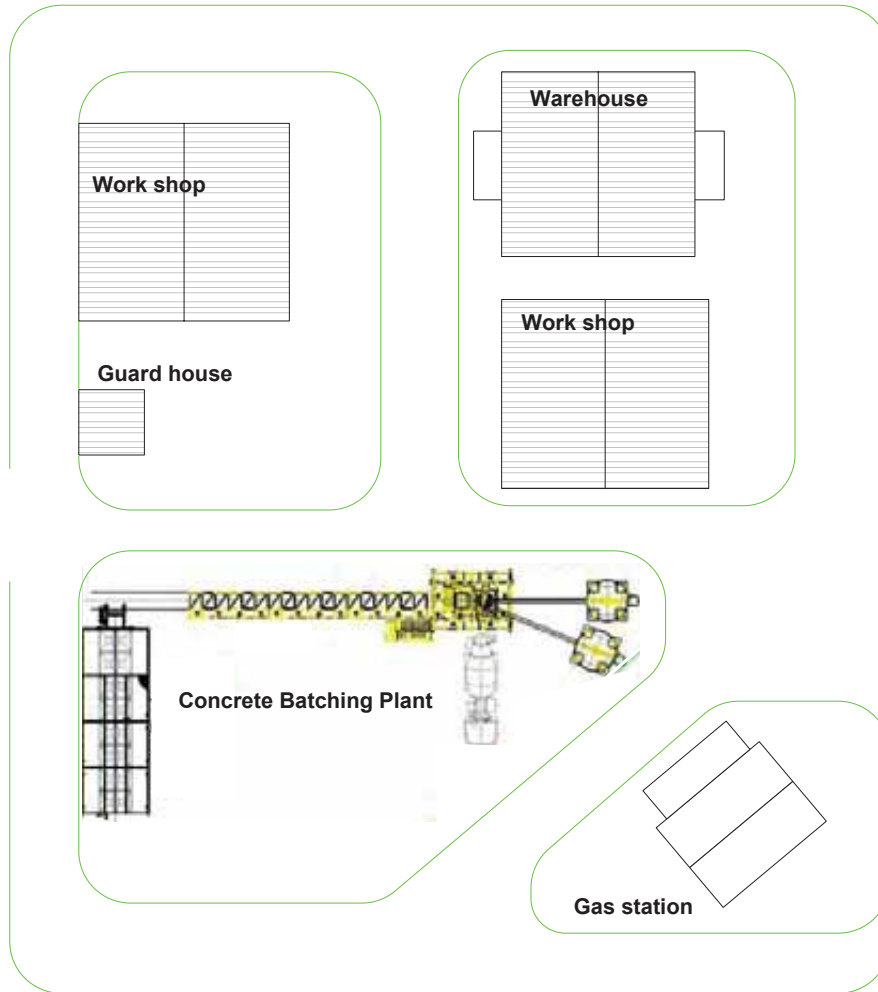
Scheme of Nenskra dam construction site
